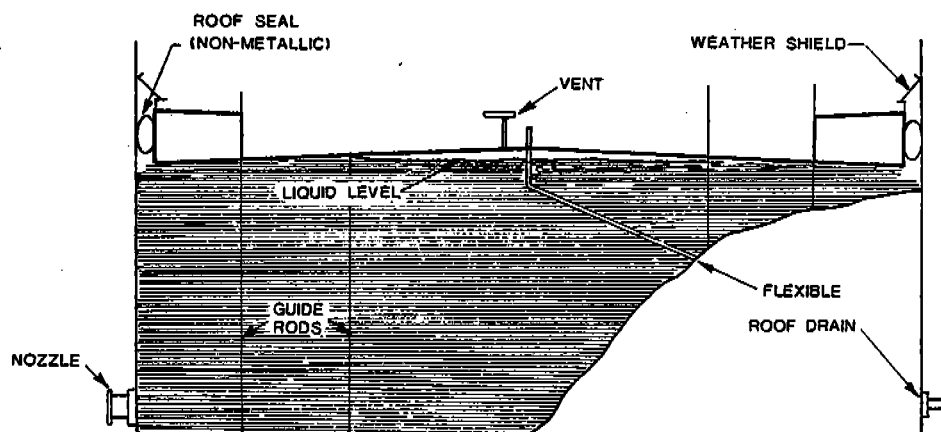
Single deck pontoon floating roof storage tank with non-metallic seals.
